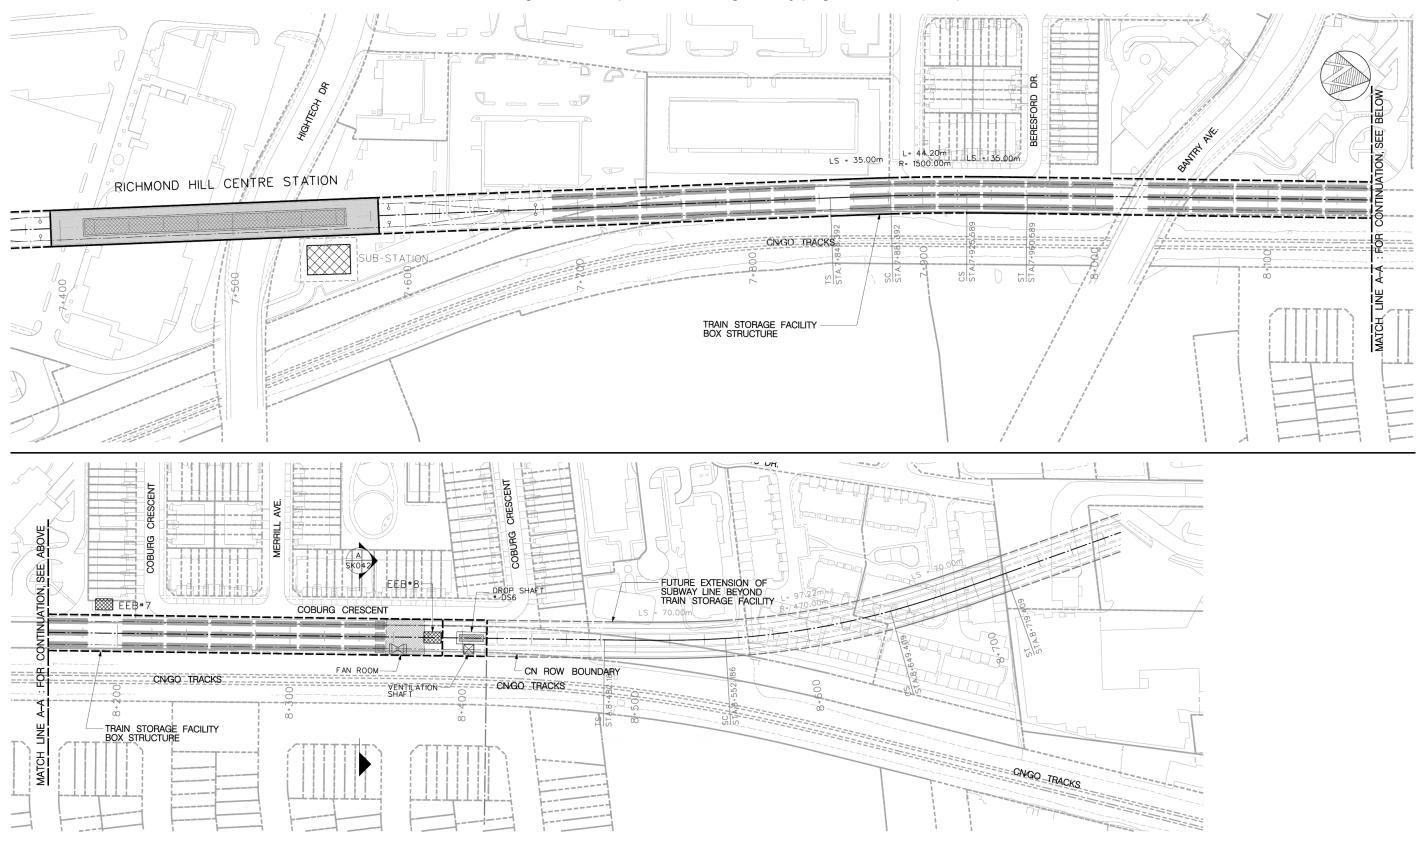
Proposed Train Storage Facility (Alignment Bi, Plan View)
